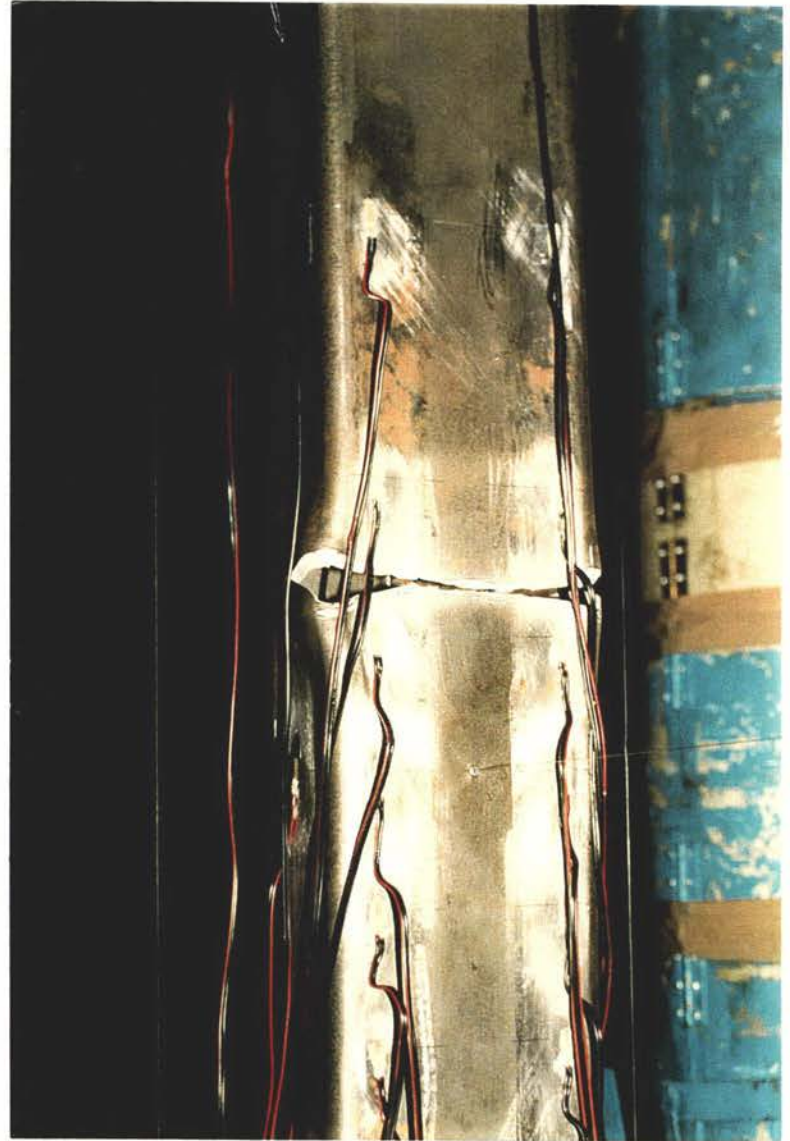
Specimen #1: view of the fracture at the end of the test.
